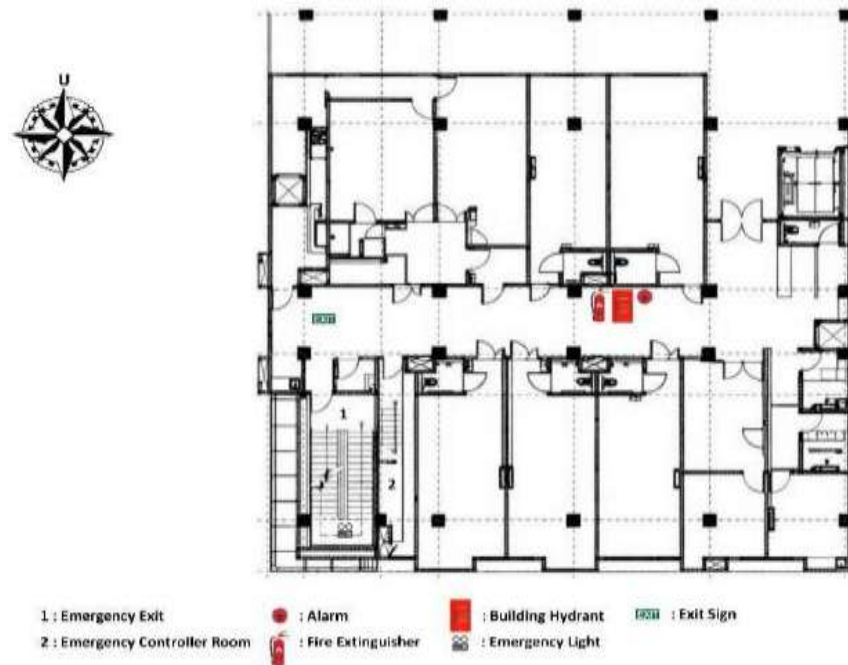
Recommendations for the completeness of the fire protection system on the 2nd floor of the pediatric inpatient and surgical building in the form of providing a fire alarm
